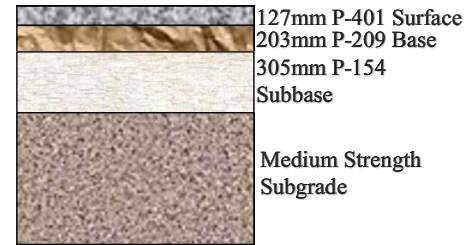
Cross section of the NAPTF MFC pavement test section (Gopalakrishnan 2004)
